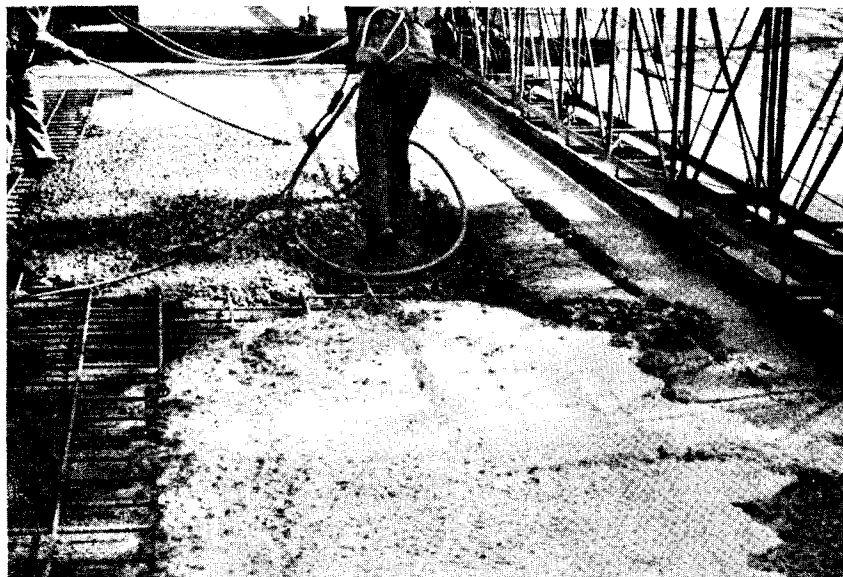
Superplasticized concrete is placed on span A B602 in Norton.
